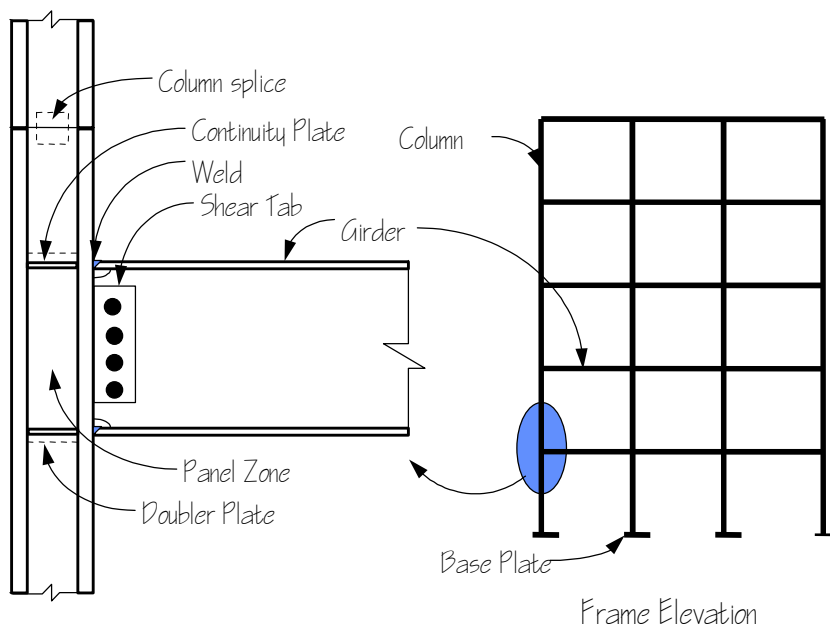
Elements of Welded Steel Moment Frame
